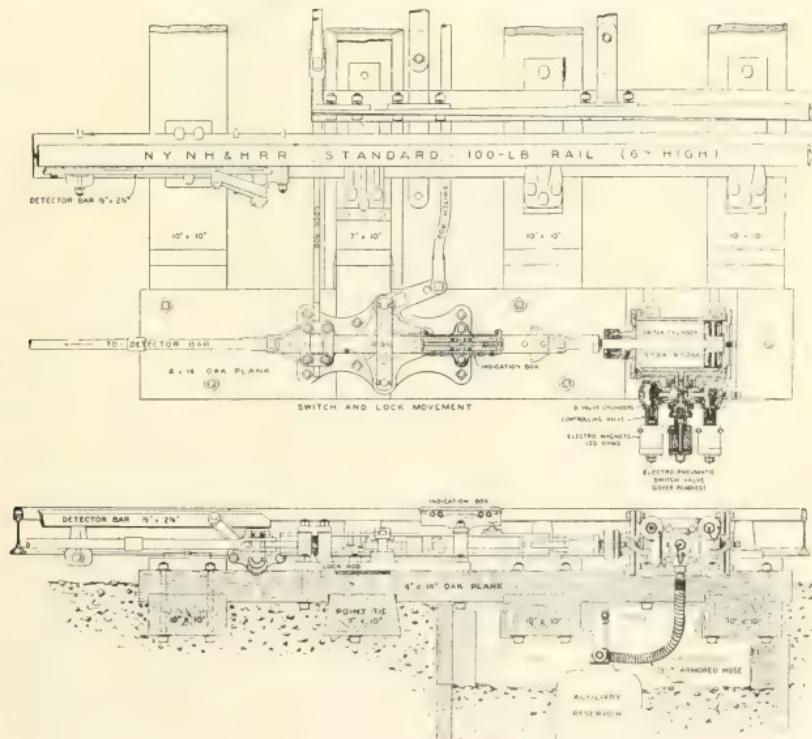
PLAN AND ELEVATION OF SIMPLE SWITCH
